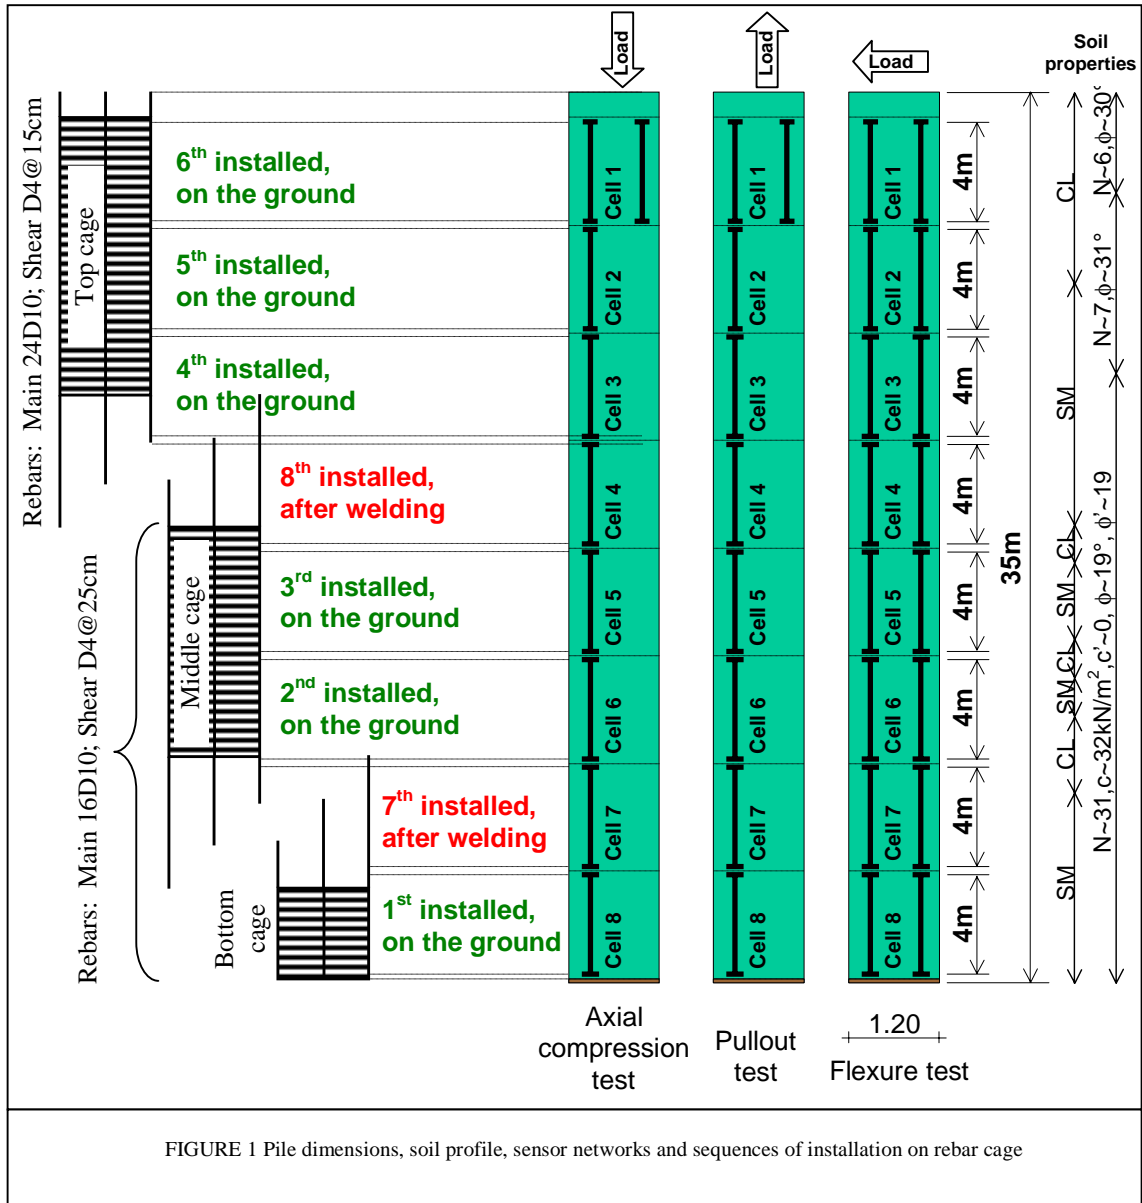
Pile dimensions, soil profile, sensor networks and sequences of installation on rebar cage
